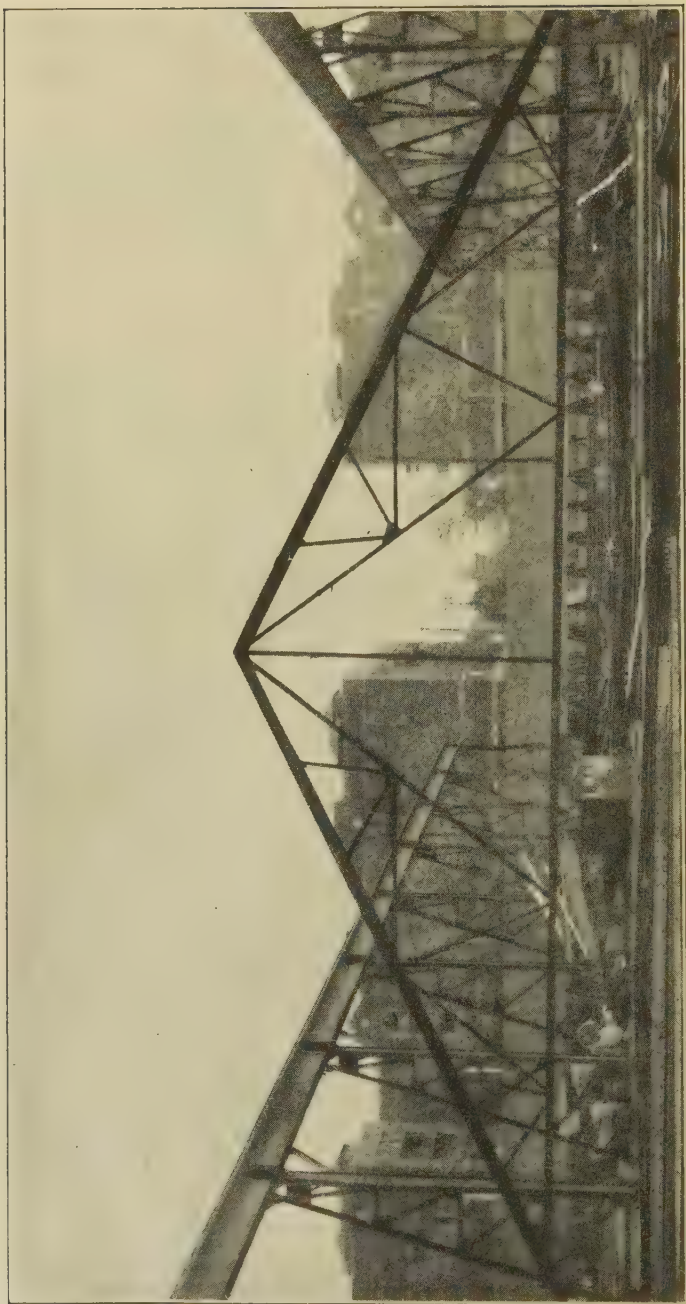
Arc-welded roof truss, 54-ft. span.
